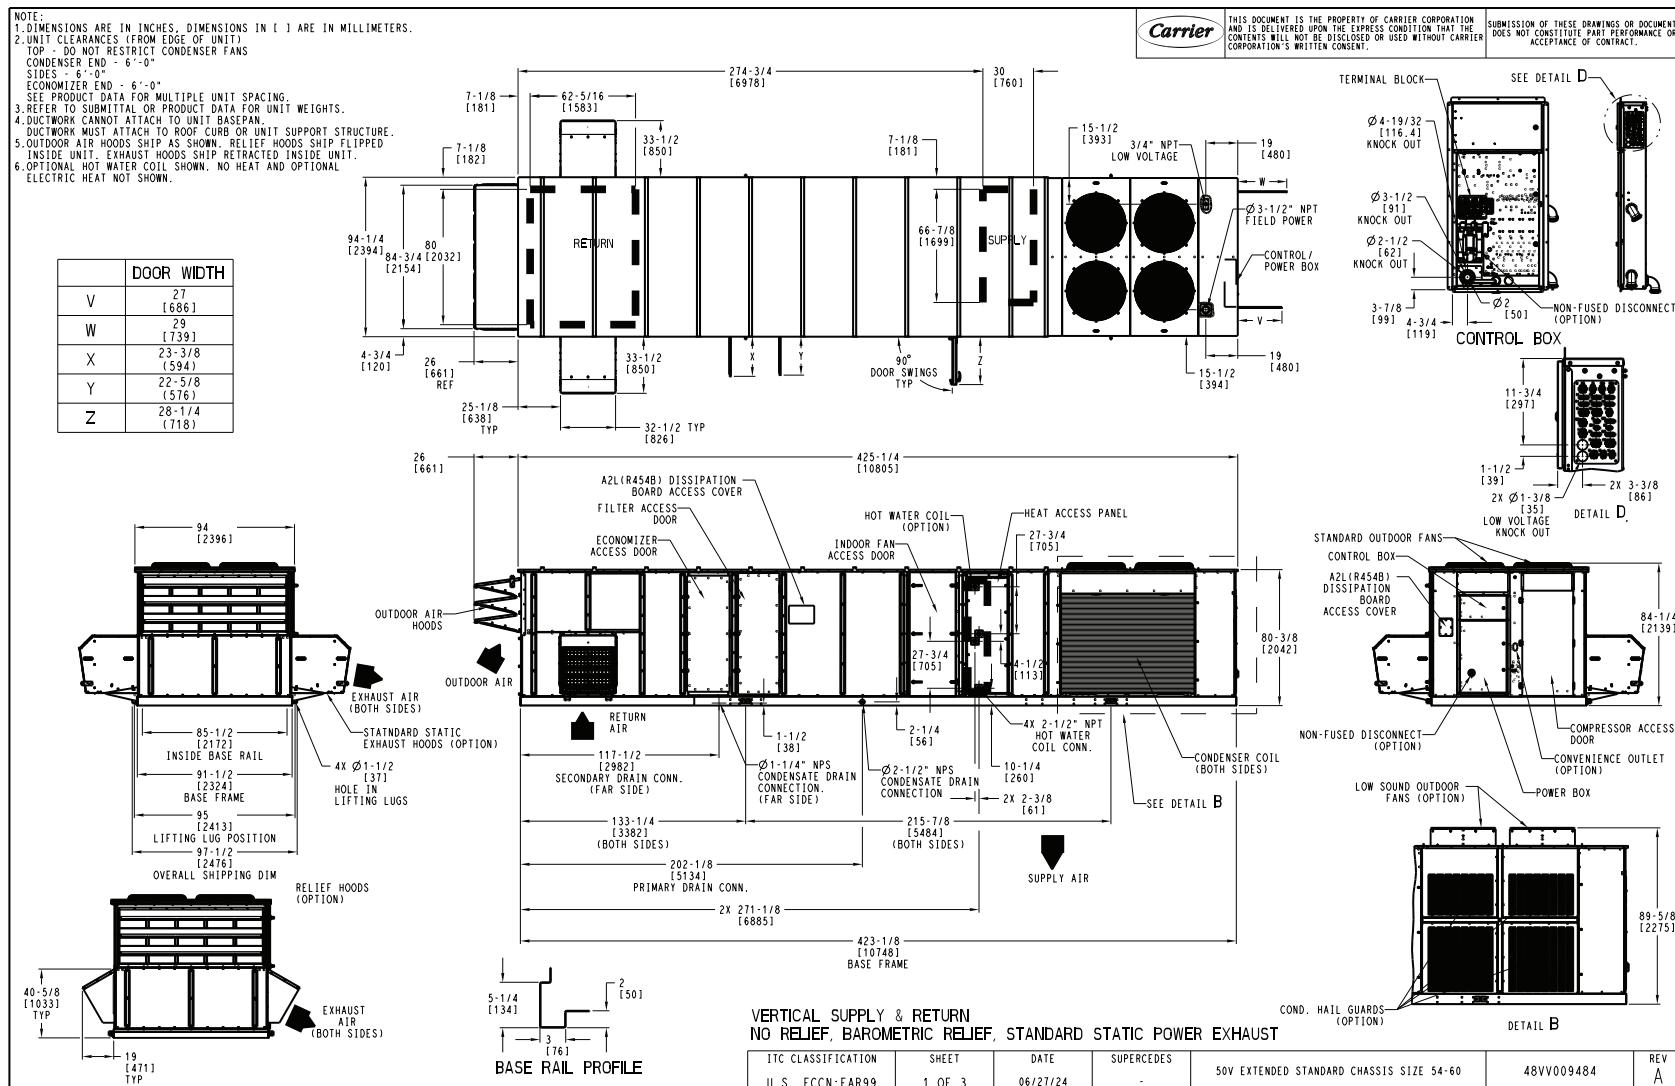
50V 55-60 Ton Extended Standard Chassis
